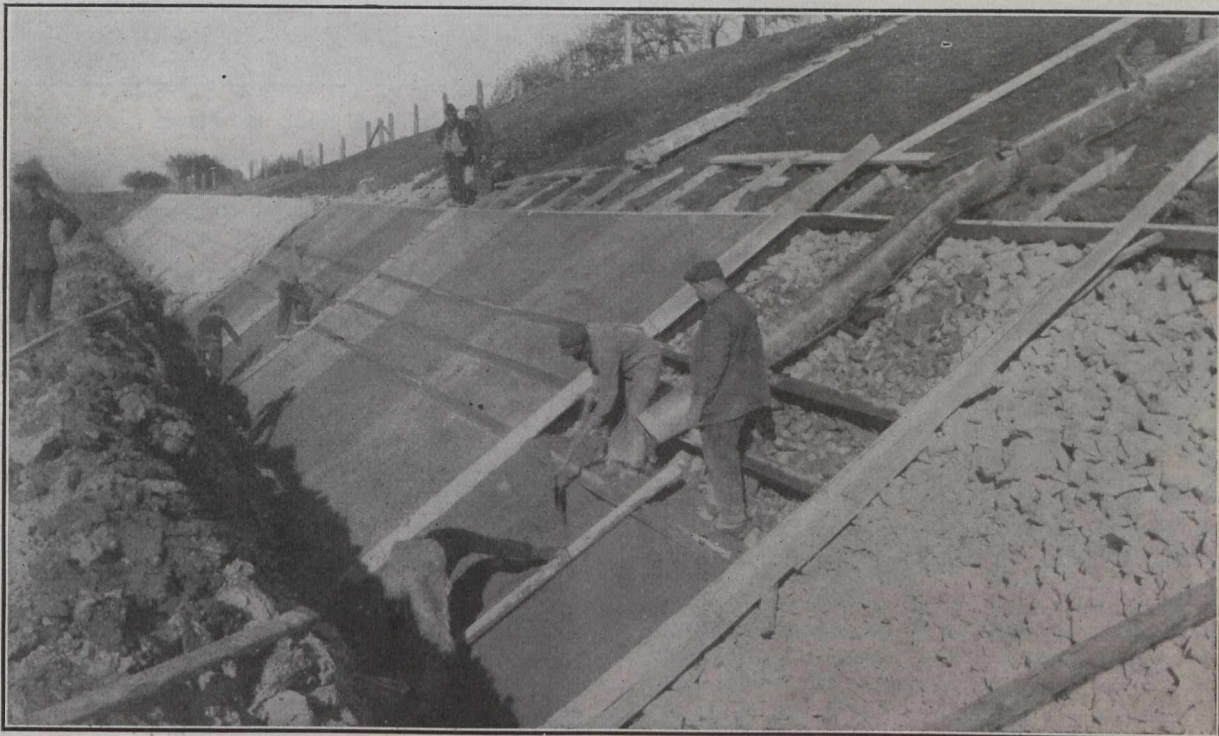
Concrete Slab Construction Showing Crushed Stone Foundation and Sodded Slope Above.
